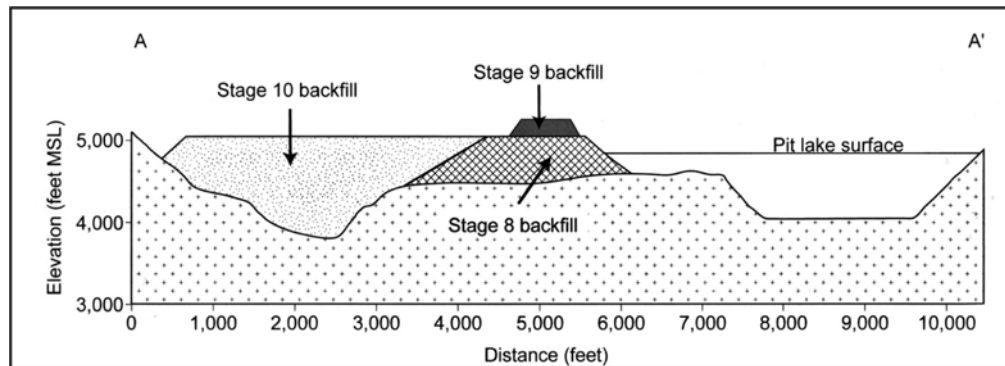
Stage 10 Cross Section A to A' through Pipeline/South Pipeline Open Pit
